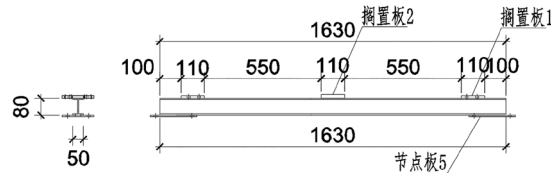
Short transom in elevation drawing (unit: mm)
